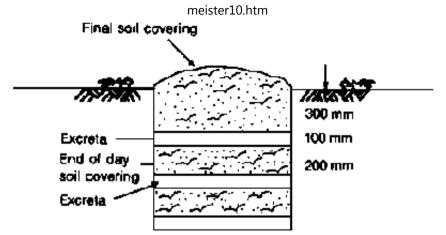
Disposing of excreta from bucket latrines by trenching (A) WHO 91457
